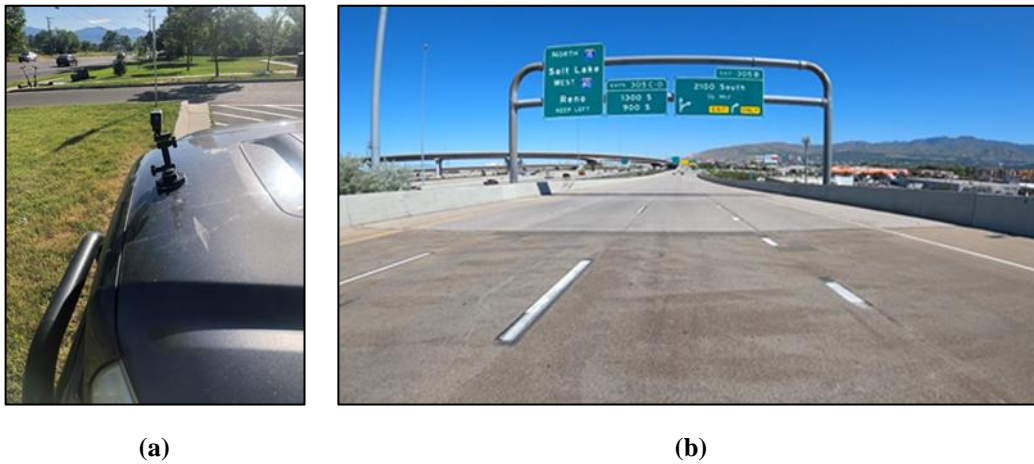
(a) camera mounting area and (b) field of view for a hood-mounted camera
